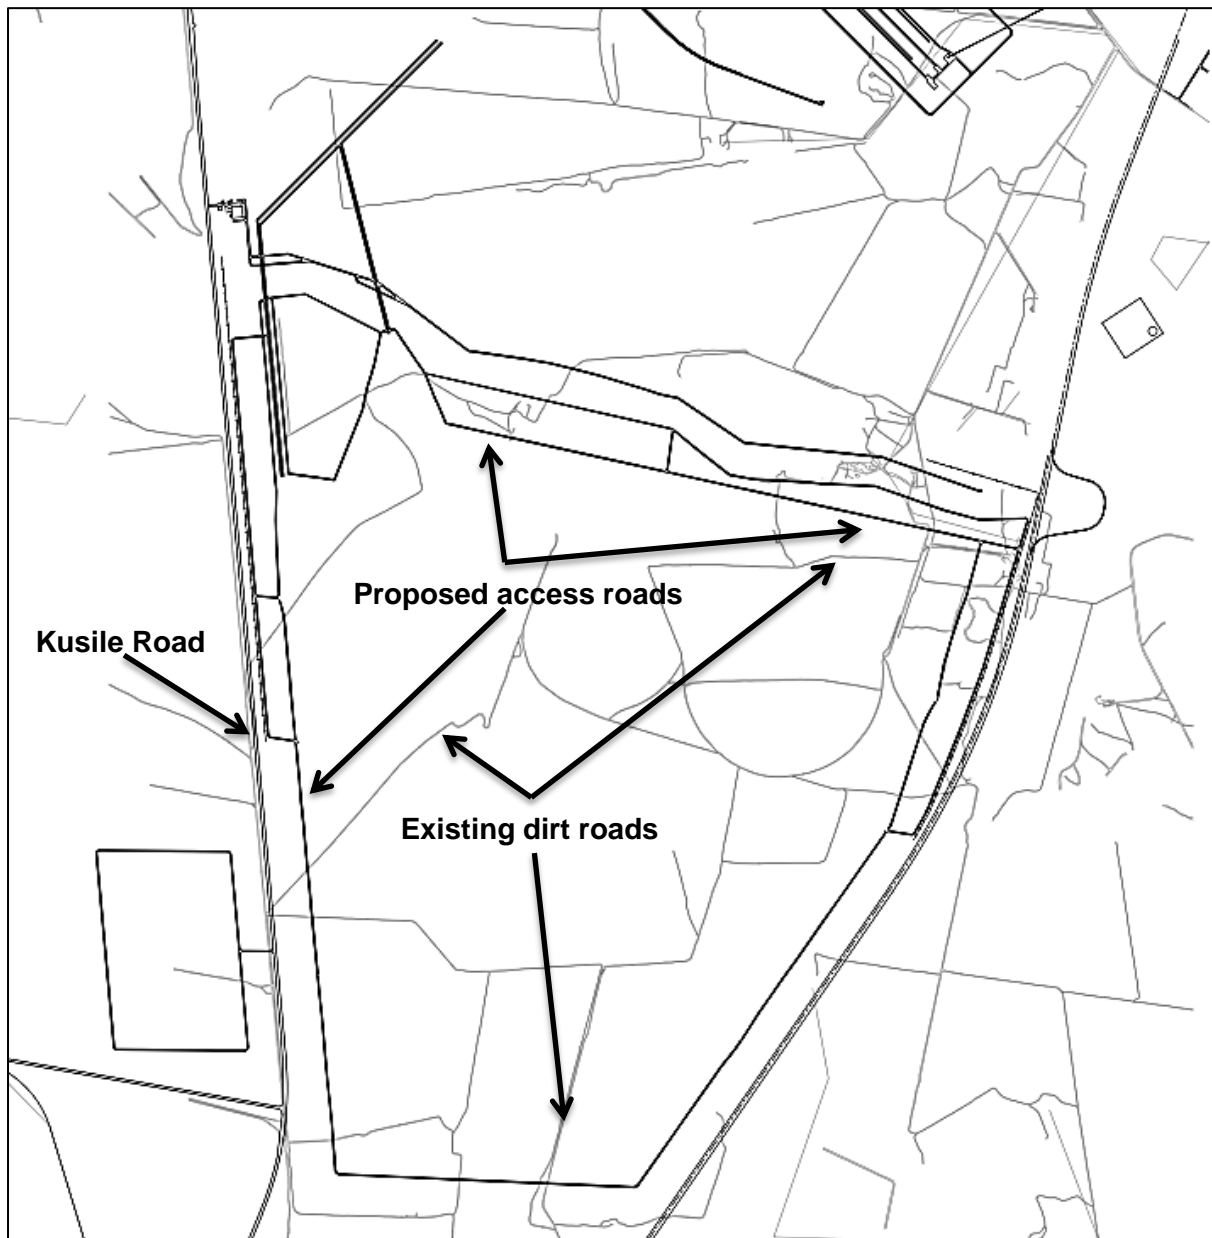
Existing and proposed road layout for the site A footprint and adjacent areas
